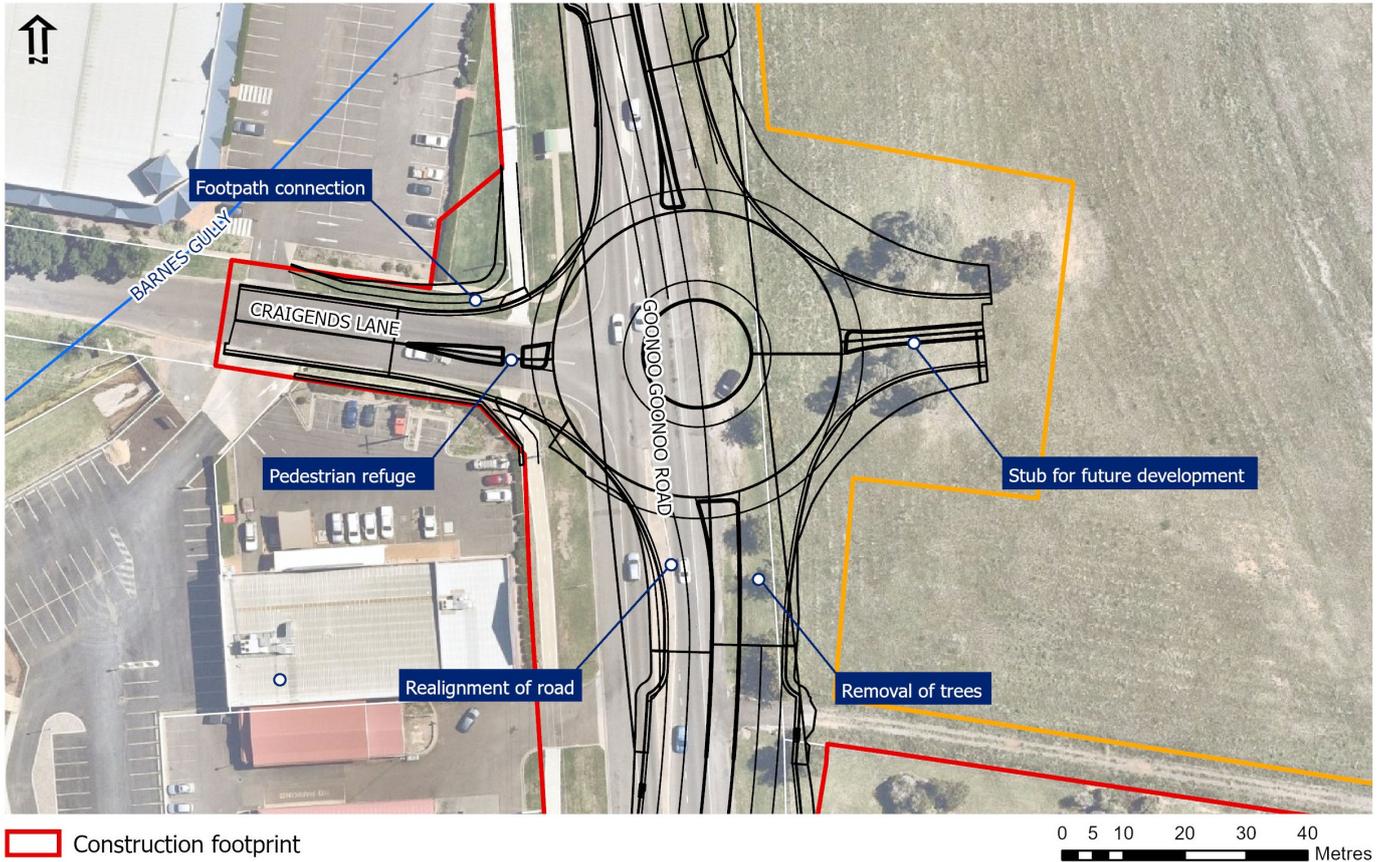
Proposed roundabout at Goonoo Goonoo Road / Craigends Lane intersection
